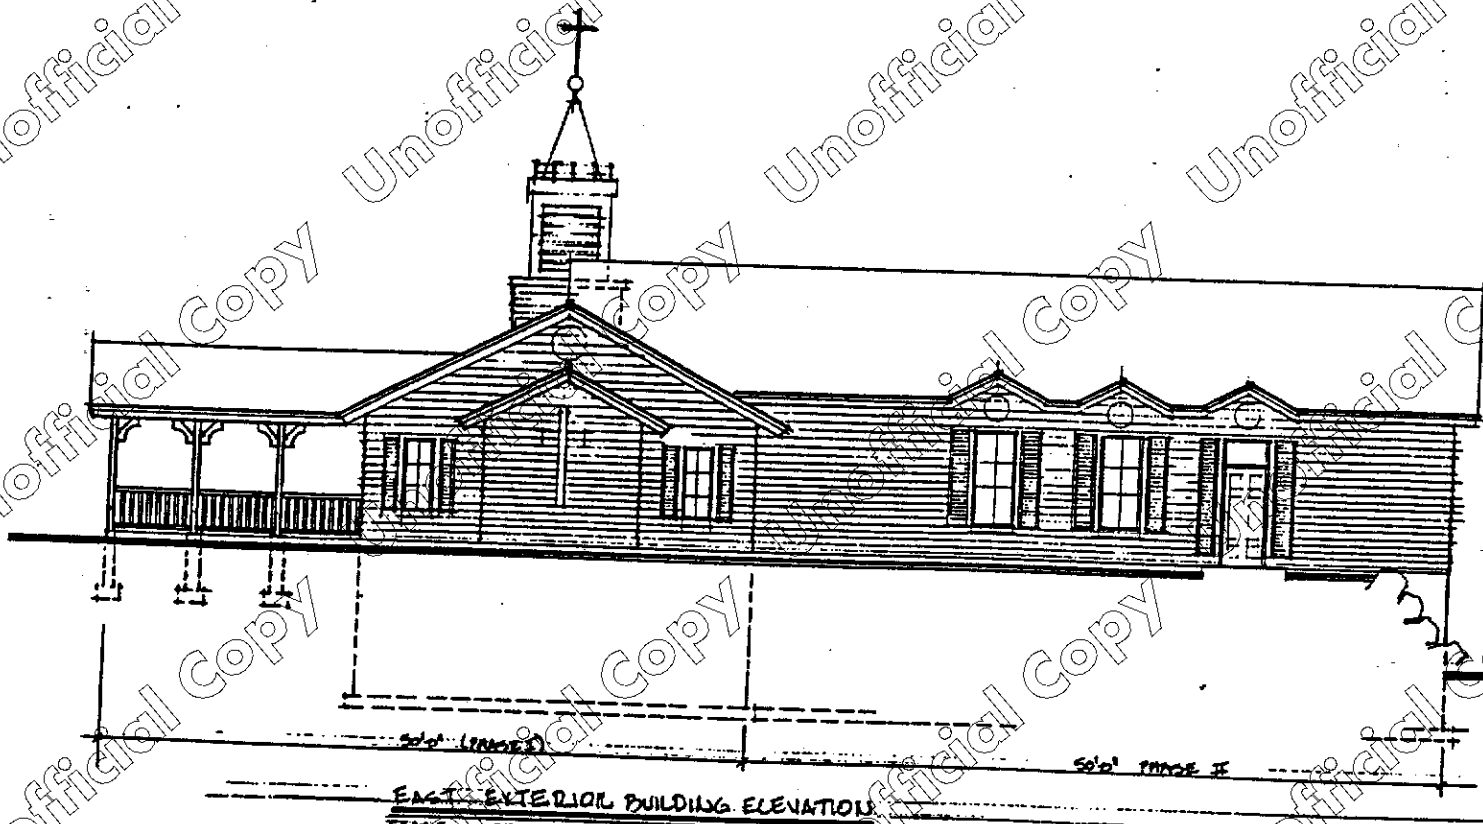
Park City Baptist Church Architectural Elevations, Materials, and Colors
